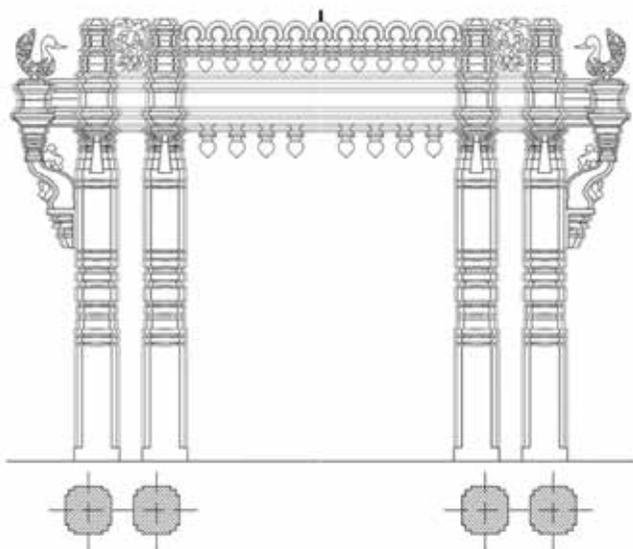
Plan and elevation of thorana (Source : M/s Kshetra)
